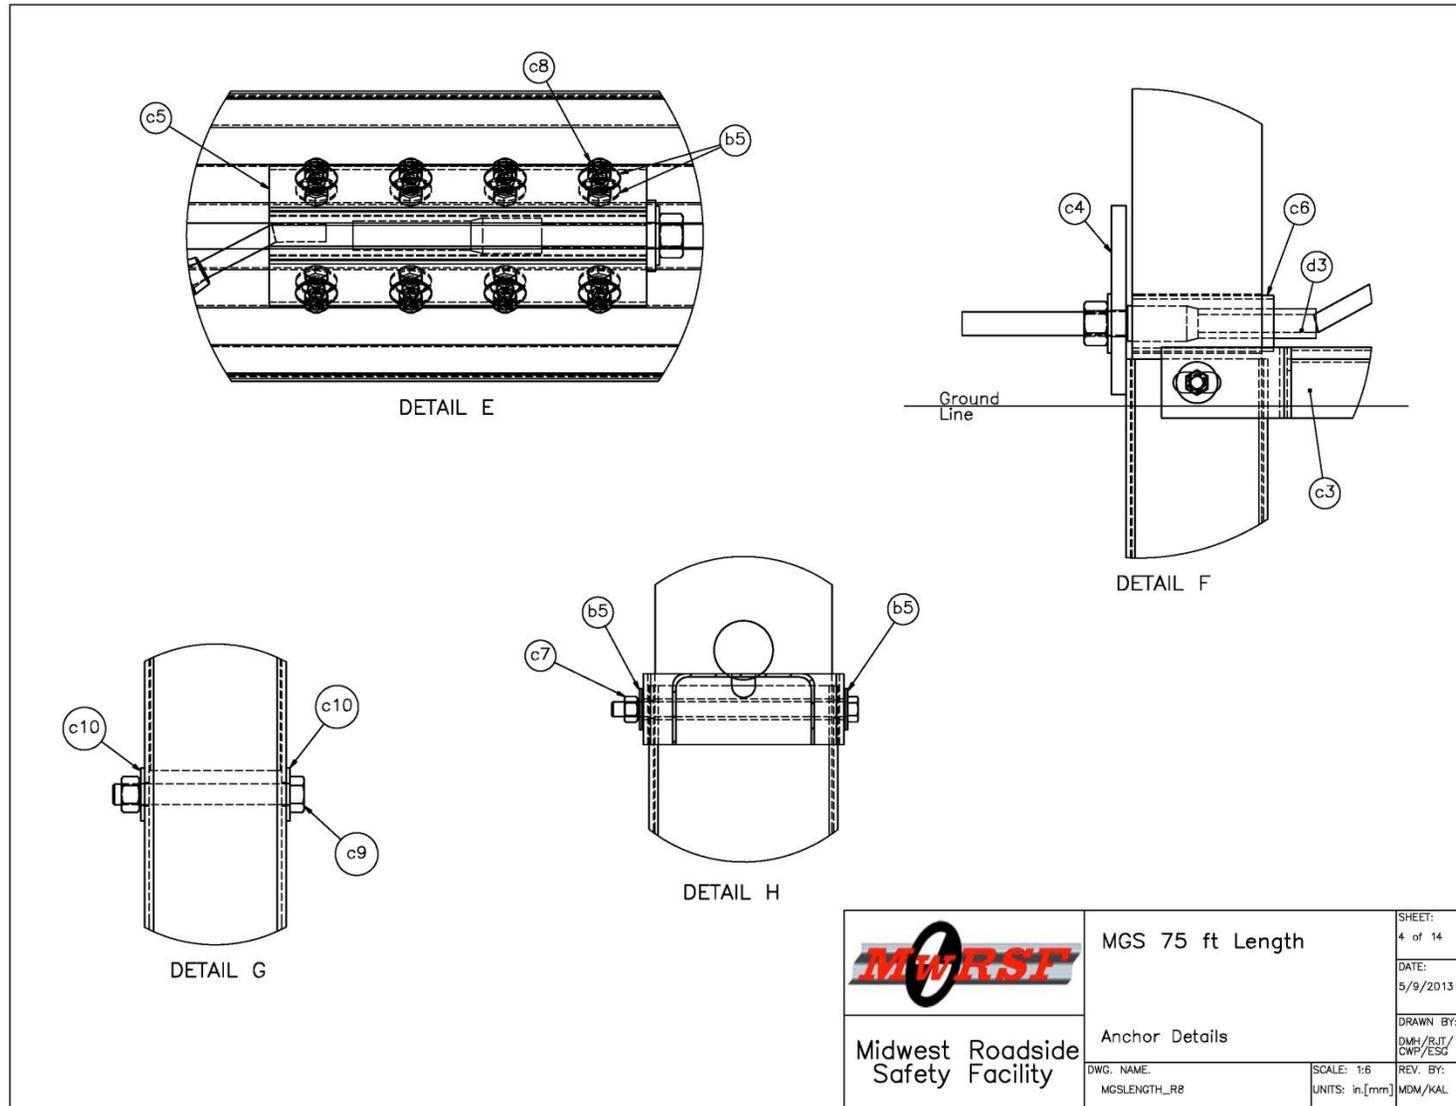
BCT End Anchor Details, Test No. MGSMIN-1
